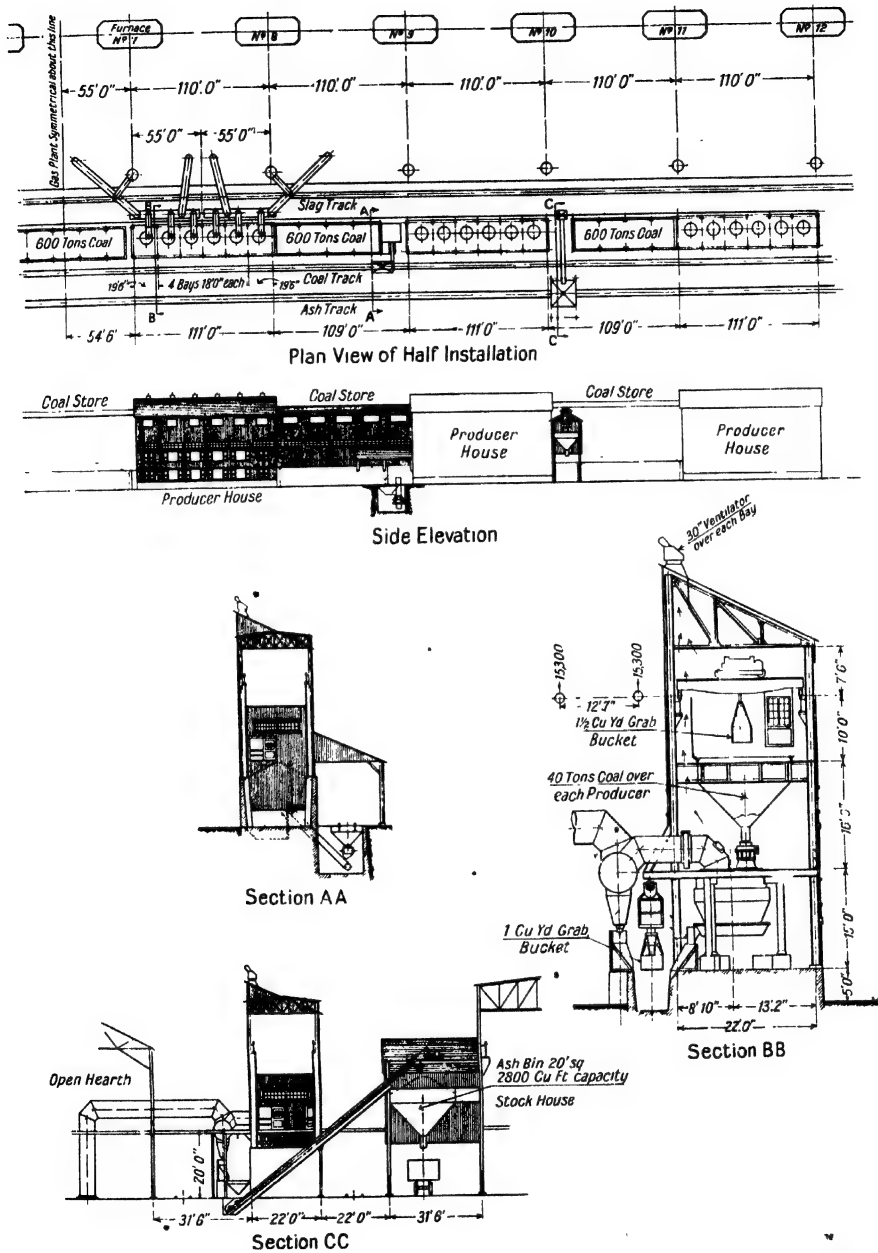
ARRANGEMENT OF MORGAN PRODUCER GAS MACHINE FOR 12-100 TON SIEMENS FURNACES.
